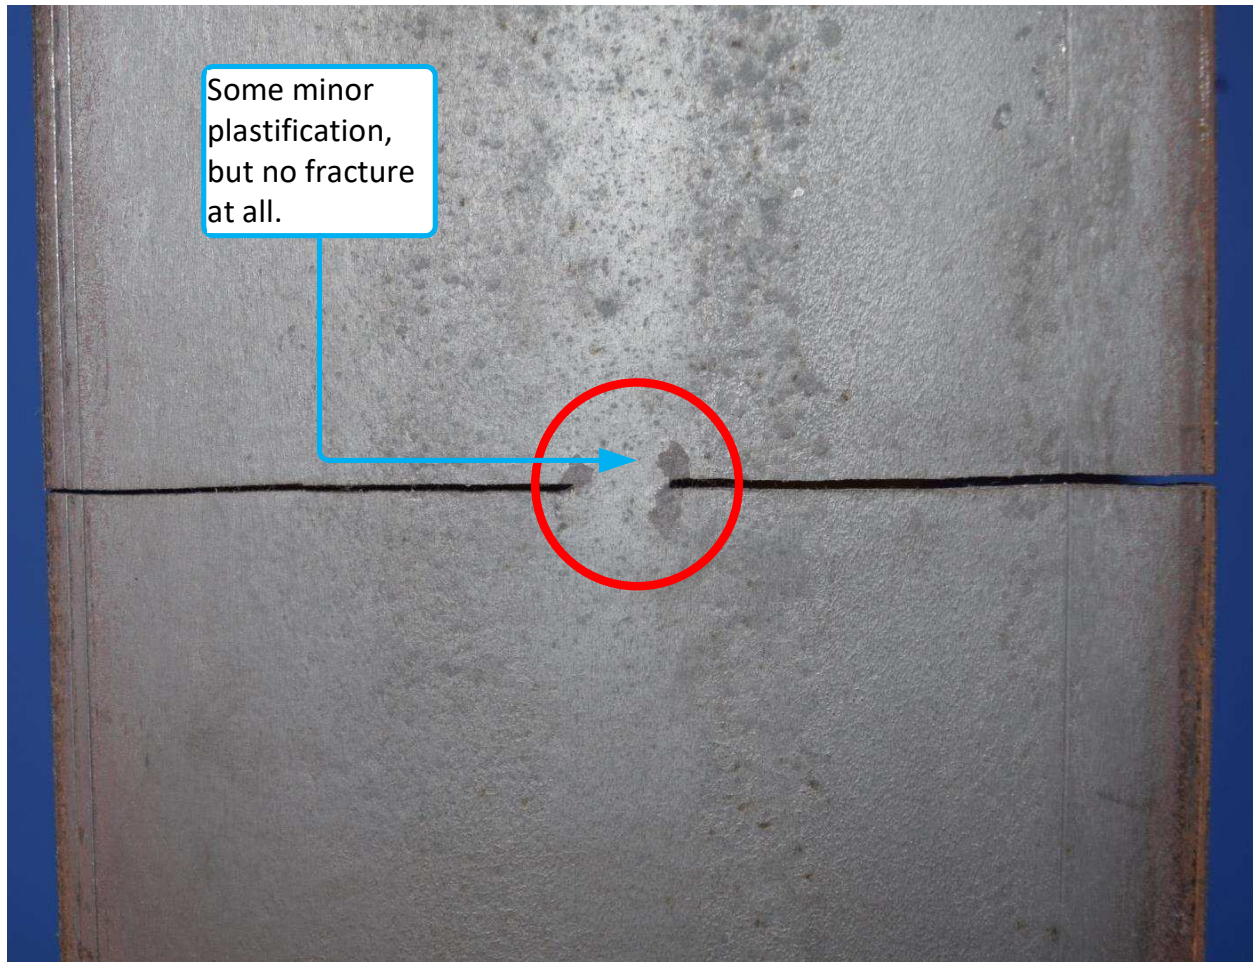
Specimen 4 mid span bottom flange view after failure
